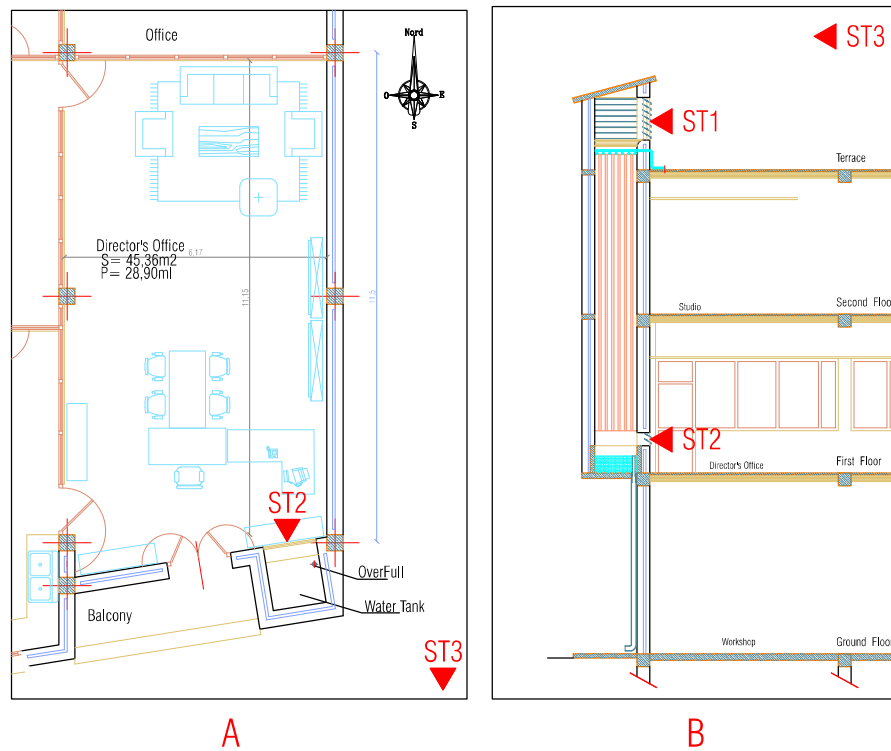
Position of measurement stations (A) plan section (B) longitudinal section
